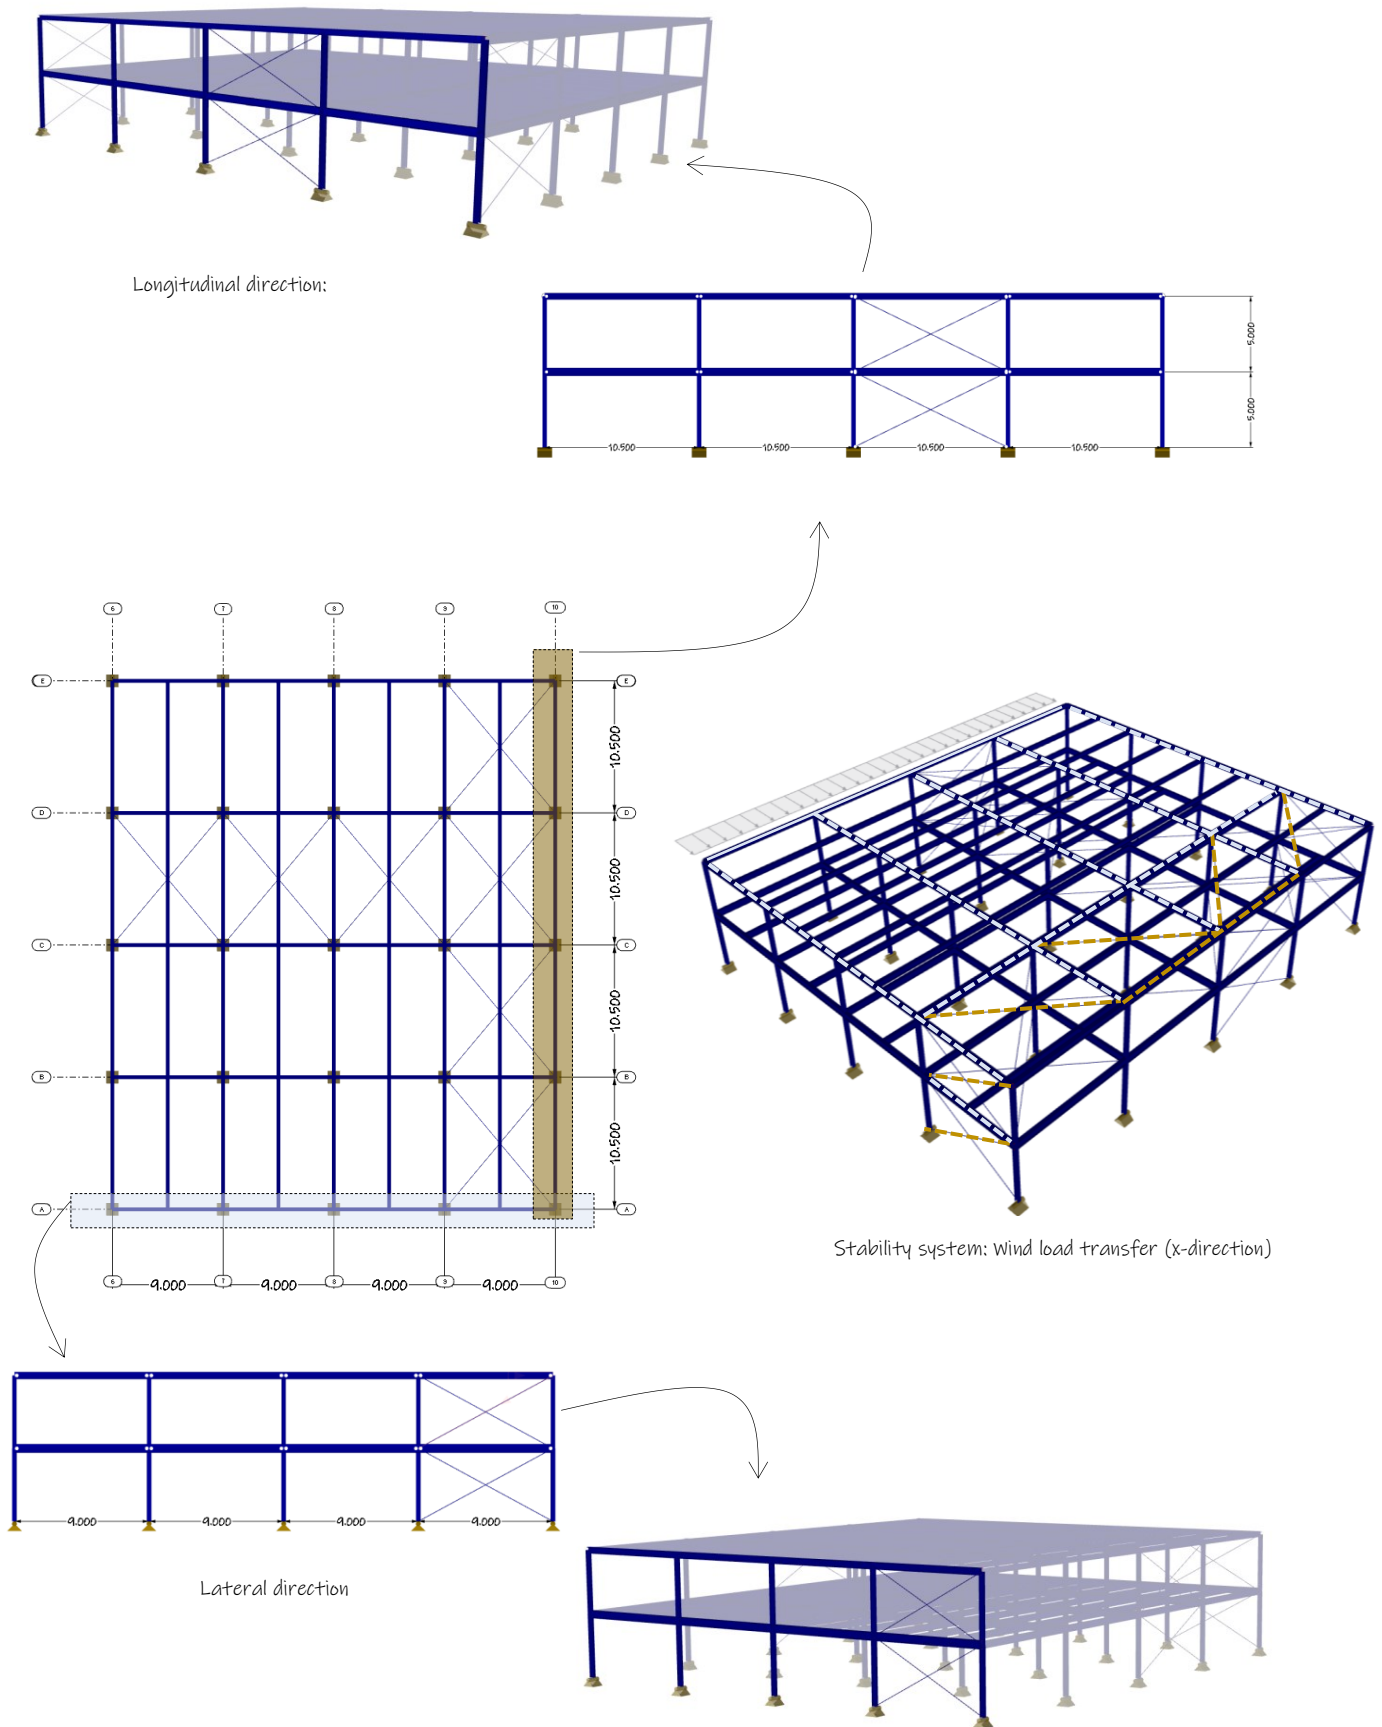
Demountable design conceptual structural overview: Side views, floor plan, and stability system.
